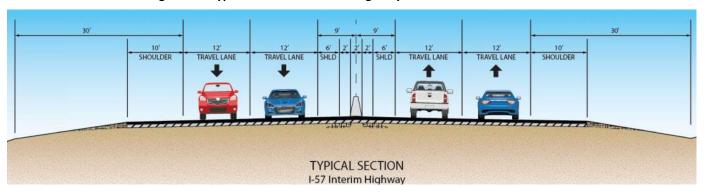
Typical Section of Interim Highway for Alternatives A and C
